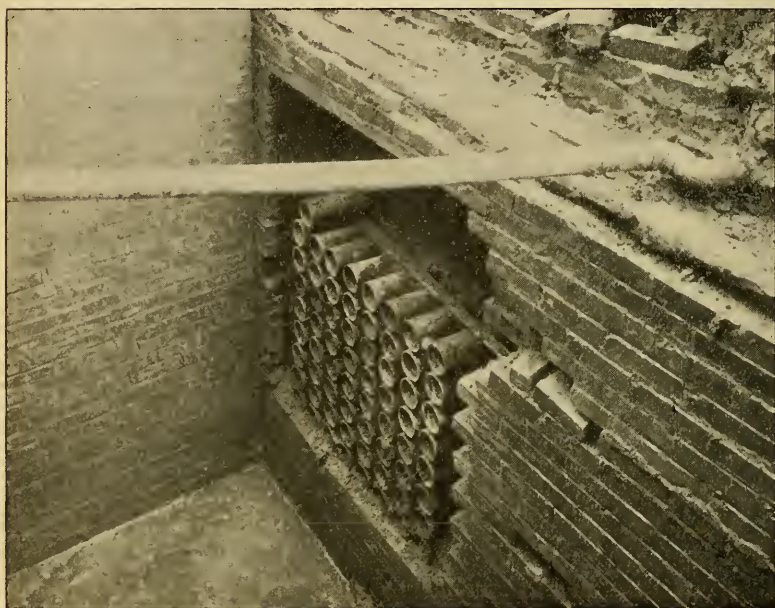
MANHOLE OF UNDERGROUND SYSTEM SHOWING DUCTS DURING CONSTRUCTION.
